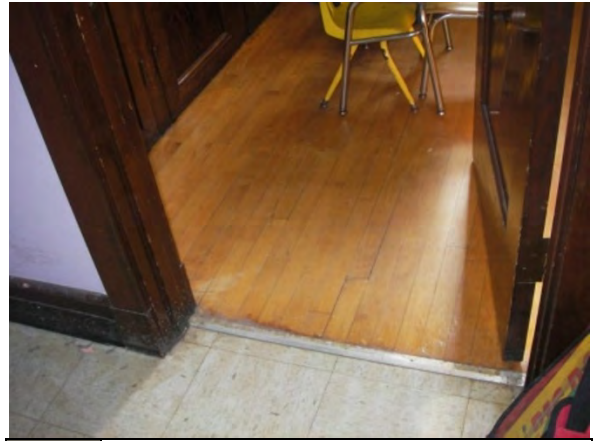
TEACHER'S ROOM TILE AND HARDWOOD FLOOR IS WORN
